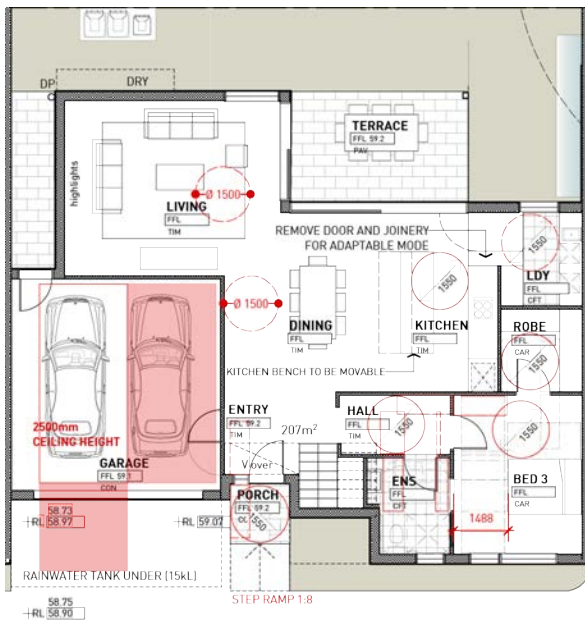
Accessible dwellings and universal designed dwellings require additional space for circulation. Locating a bedroom on the ground floor of a two storey dwelling allows flexibility in accommodating a diverse range of needs.
